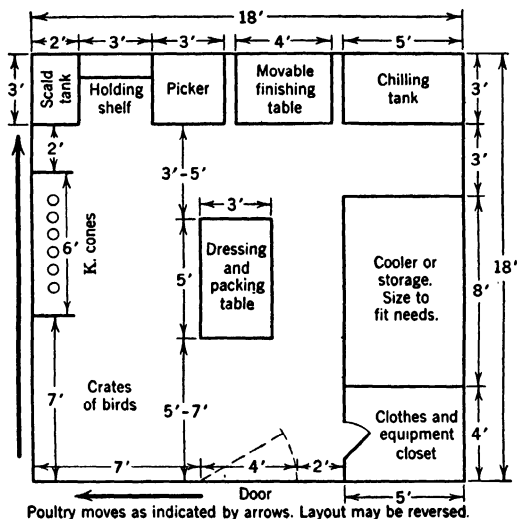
Killing, dressing, and cooling room. A suggested guide for placing equipment.
